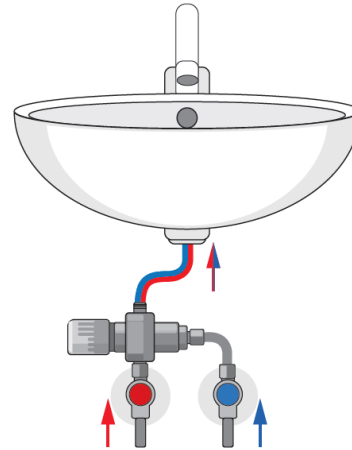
Installation under spouts (only mixed water provided). Typical for public applications.
